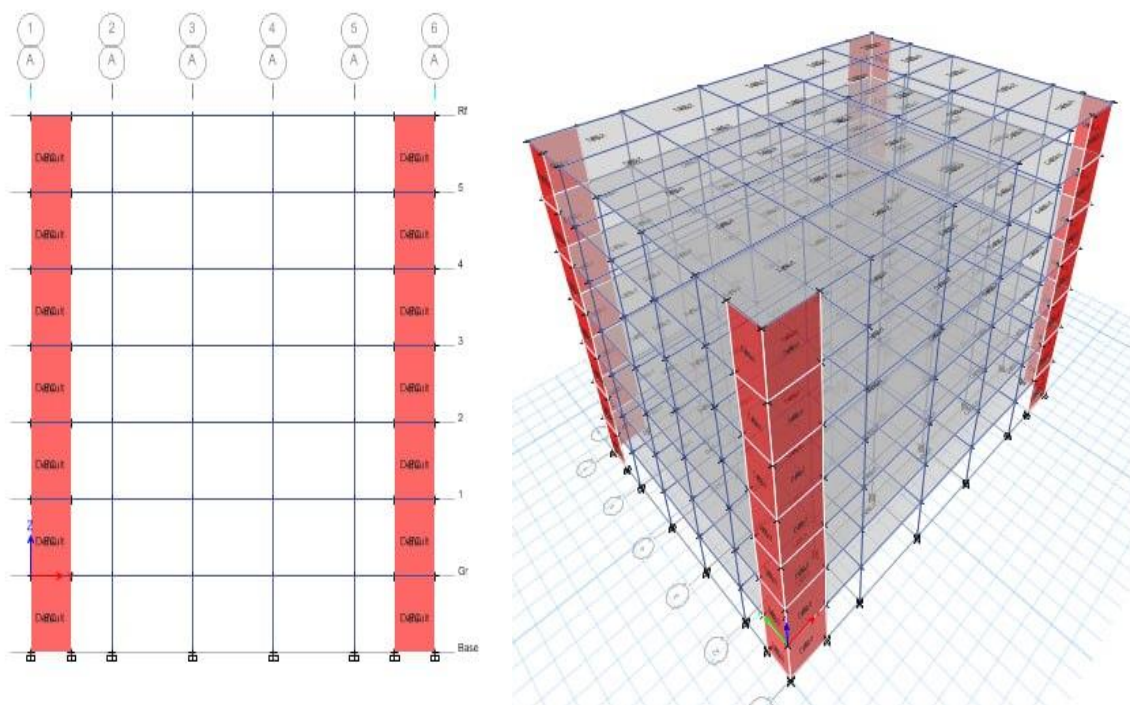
2 G+5 building with Shear wall location at edge with no opening
